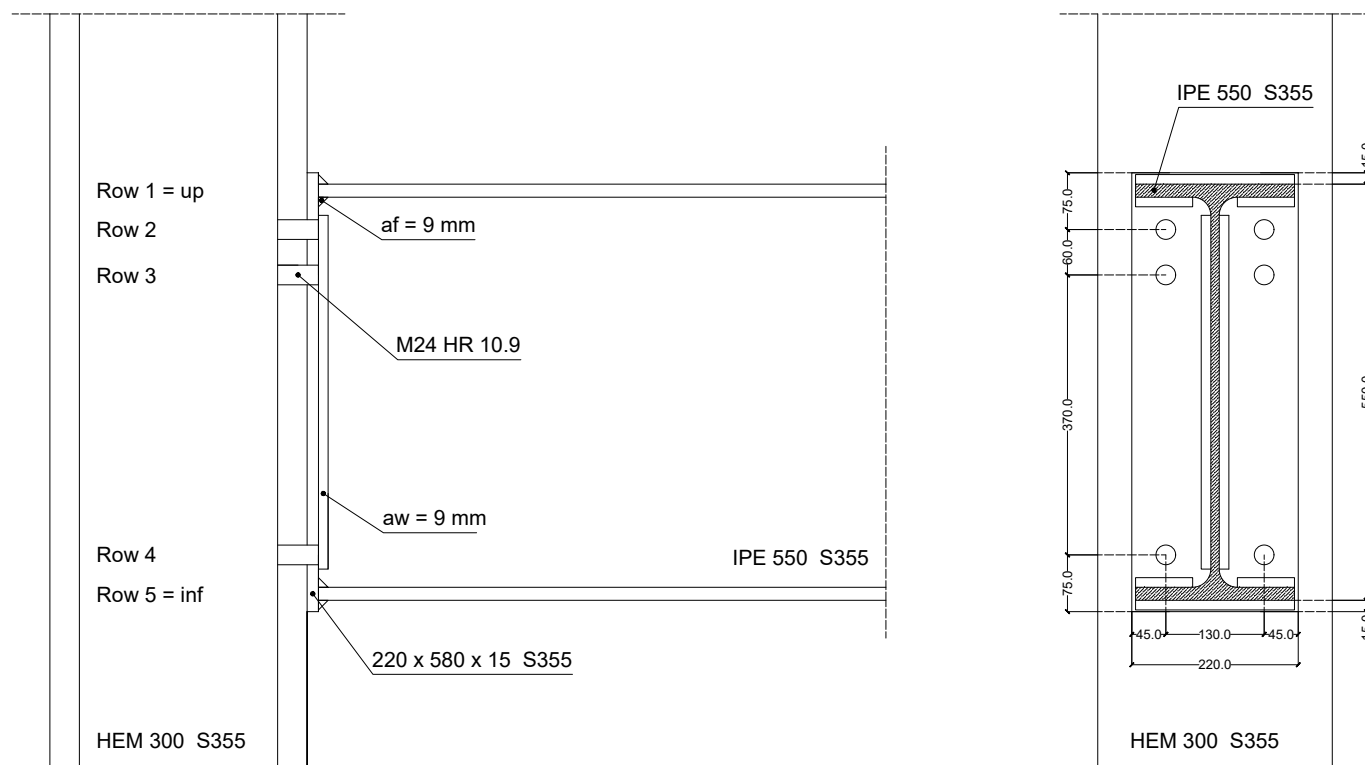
FAILNOMORE - Joint configurations B3 - Technical drawing
